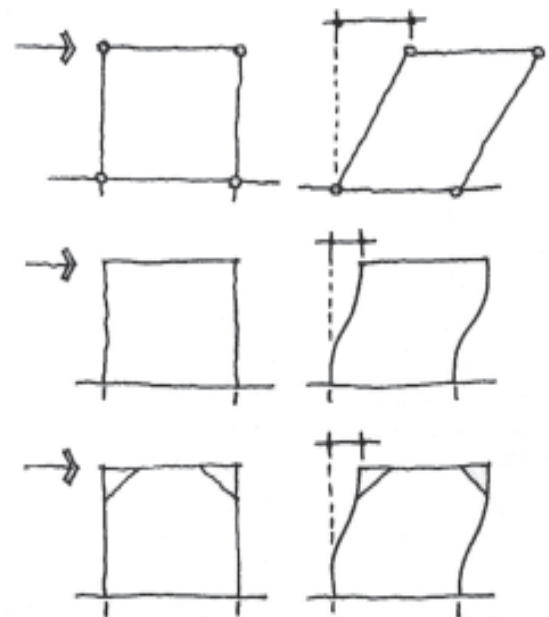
The diagrams show differences in structural steel framing when acting against lateral movement. Pin connections (top) seems to be less stable than the rigid connections and diagonal bracing (center and bottom, respectively) when comparing drifting distances. More drift will allow more damage to a structure and its occupants.
